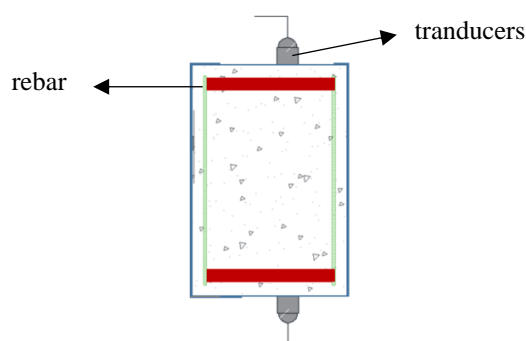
Cross section of reinforcement concrete with rebar perpendicular with transducers
